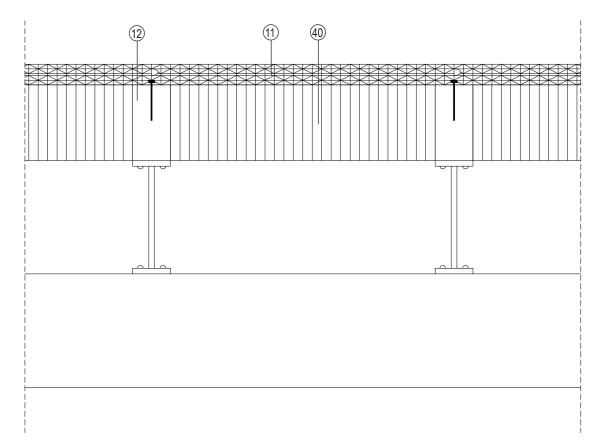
Detail 09: Polycarbonate facade plan, Own Illustration
